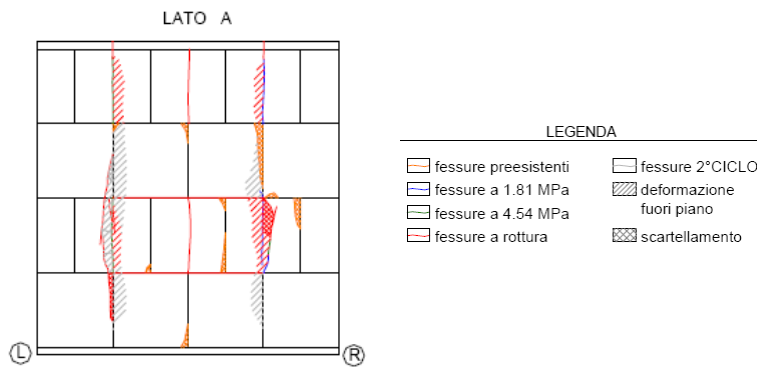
Typical crack pattern under uniaxial compression. Masonry made with thin layer joint.
